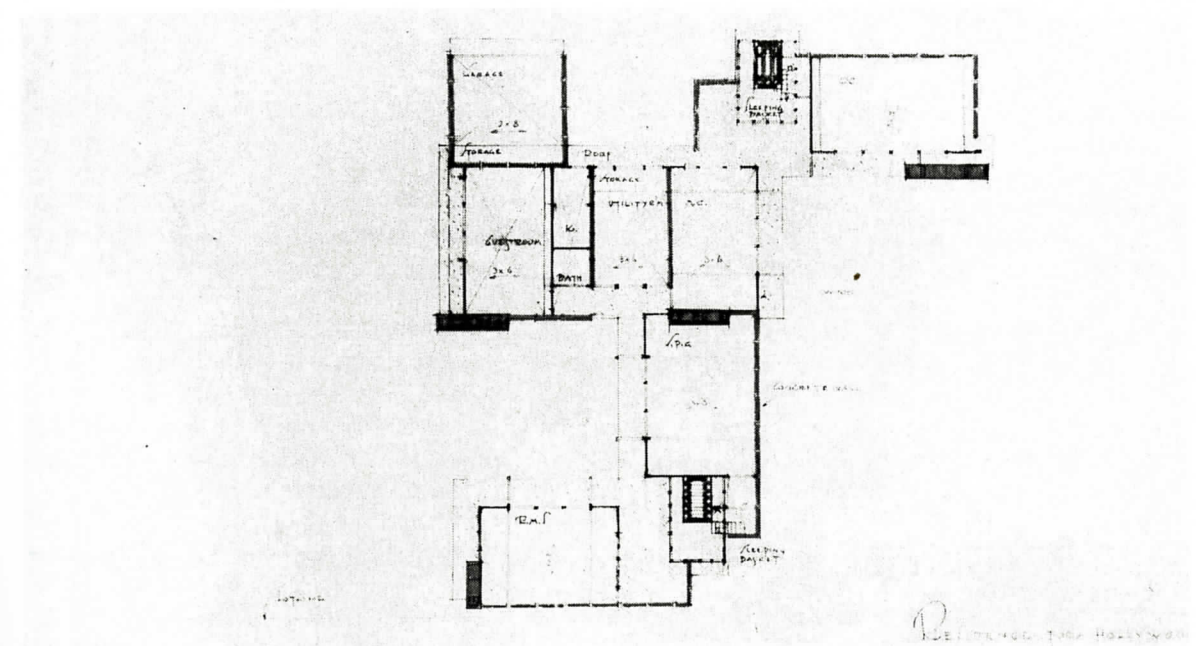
Floor Plan—Schindler House, West Hollywood, California
